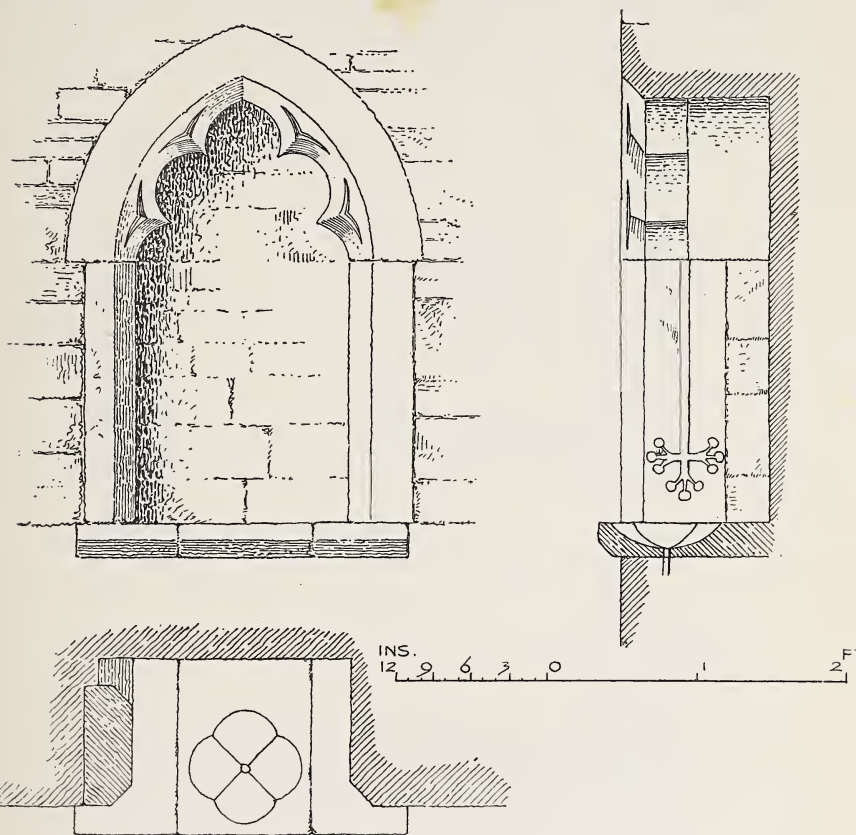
Elevation, Section, and Plan of Piscina in South Wall of Chapel at Llanblethian Church.
